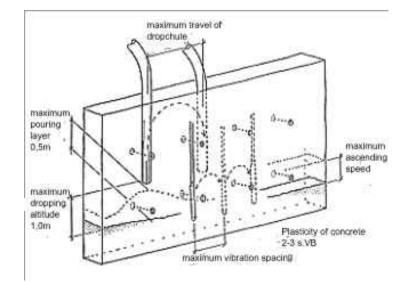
Instructions for concrete pouring to vertical structures [7, p. 322]
